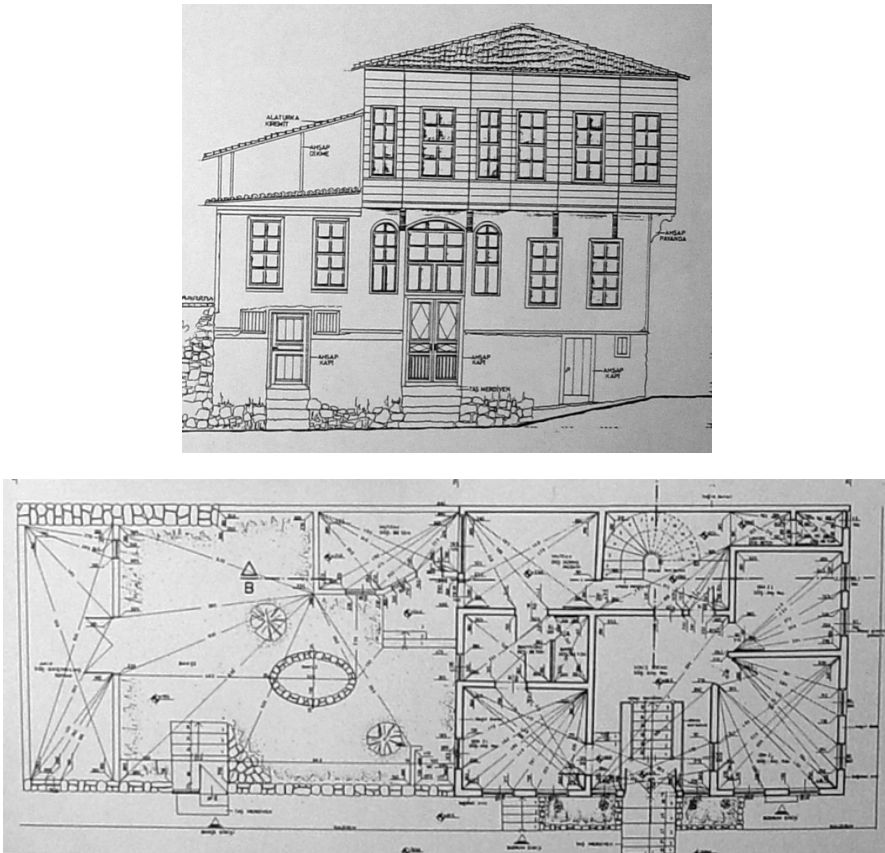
Sabri Sozen House Front Elevation and First Floor Plan
